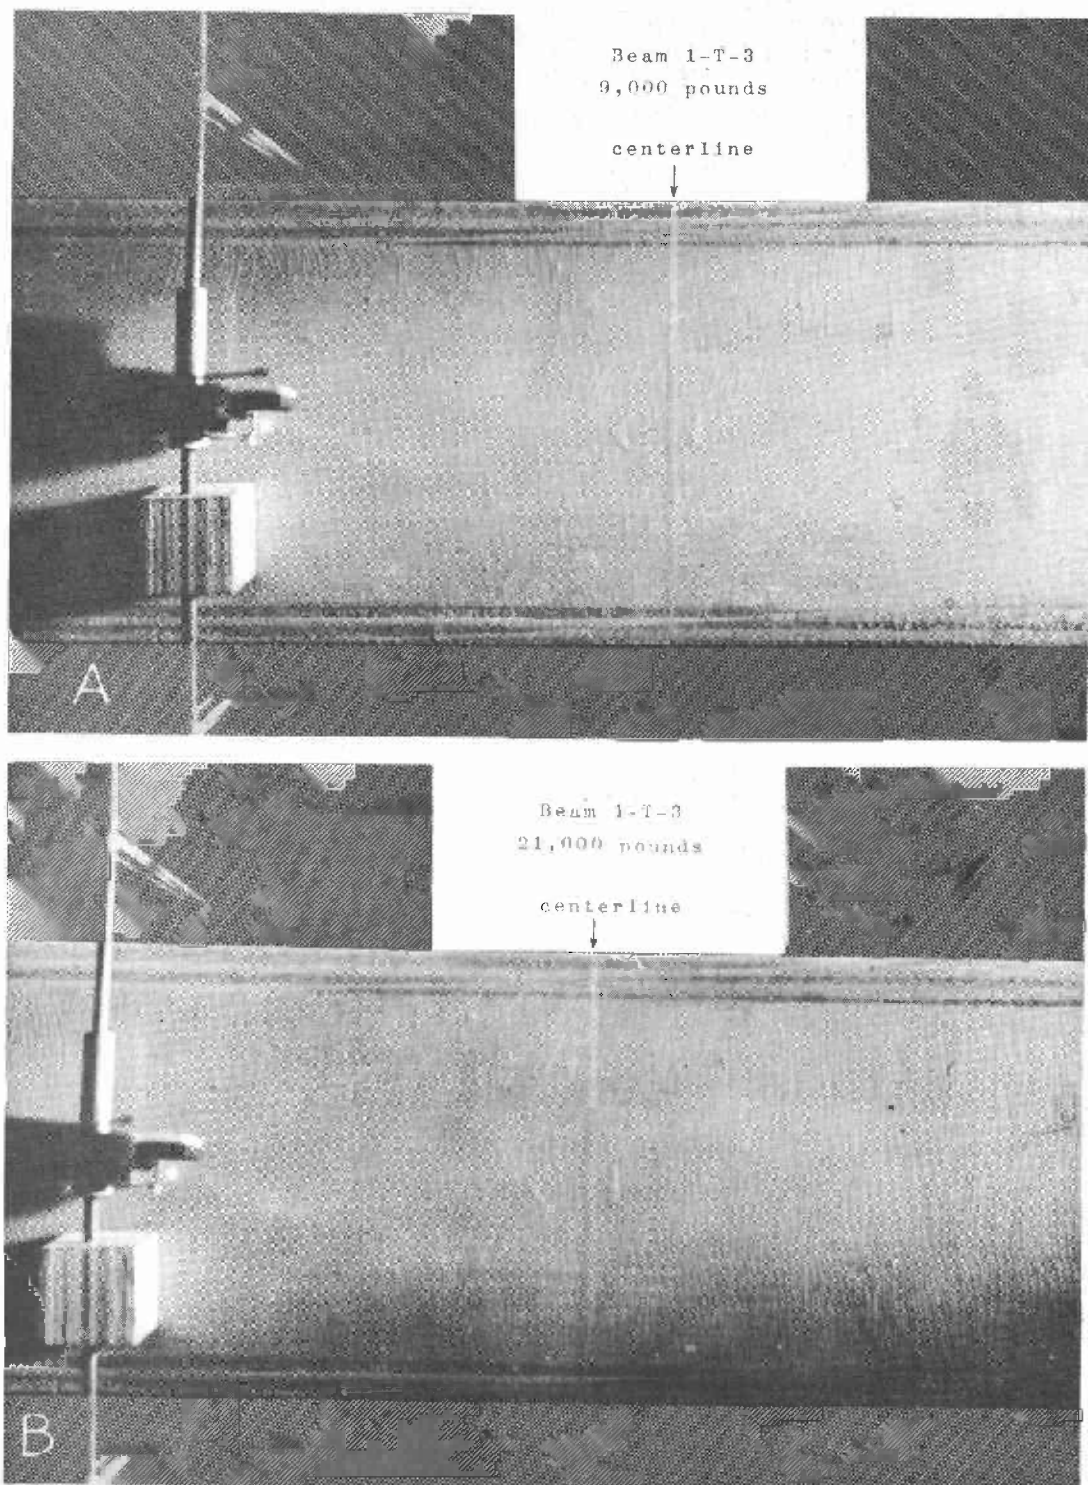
Cracking of brittle lacquer at the center of the tension flange of box beam 1-T-3: A, at 9,000 pounds total load shortly after cracking was first visible; B, at 21,000 pounds total load, showing fully developed stress cracking pattern.
